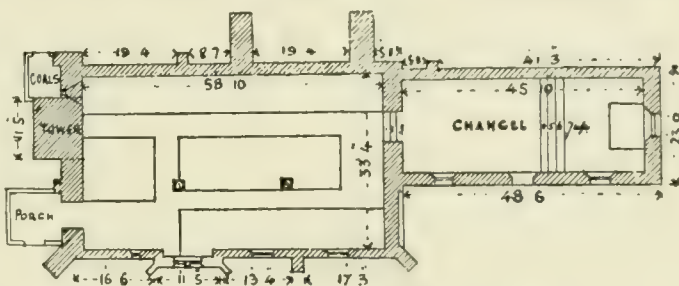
PLAN OF FORD CHURCH BEFORE RESTORATION.
